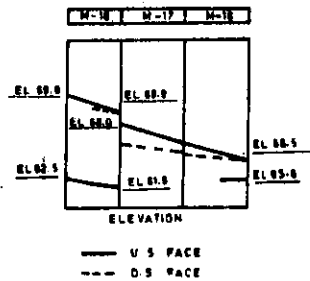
Cracks on upstream and downstream faces of monolith Nos. 16, 17 and 18
